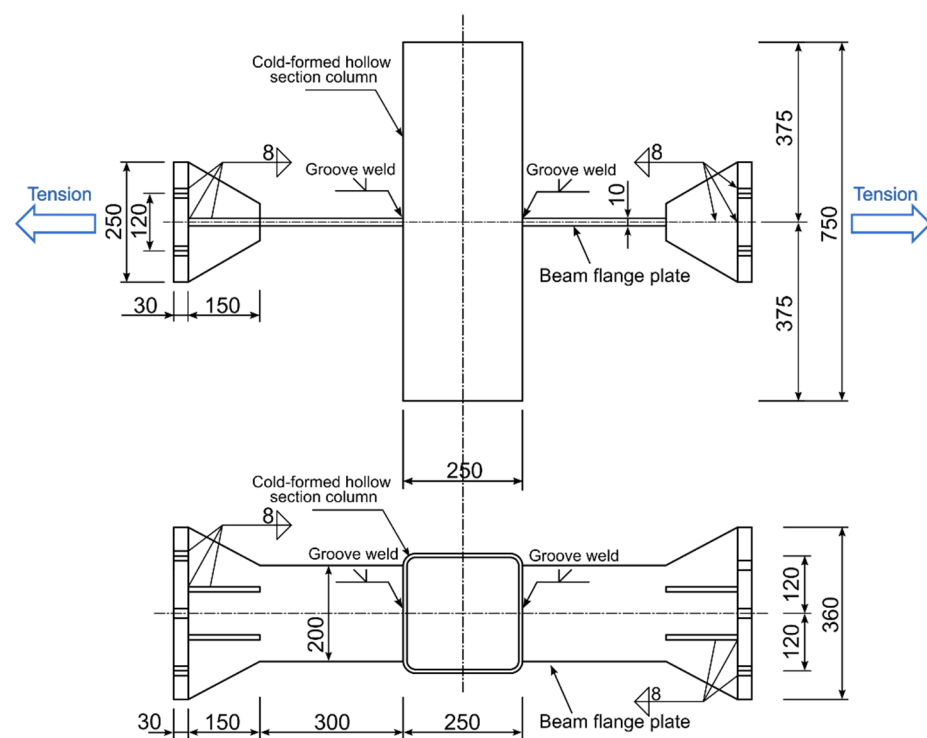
Geometry and configuration of the RP-1 connection specimen (unit: mm) [26,37].
